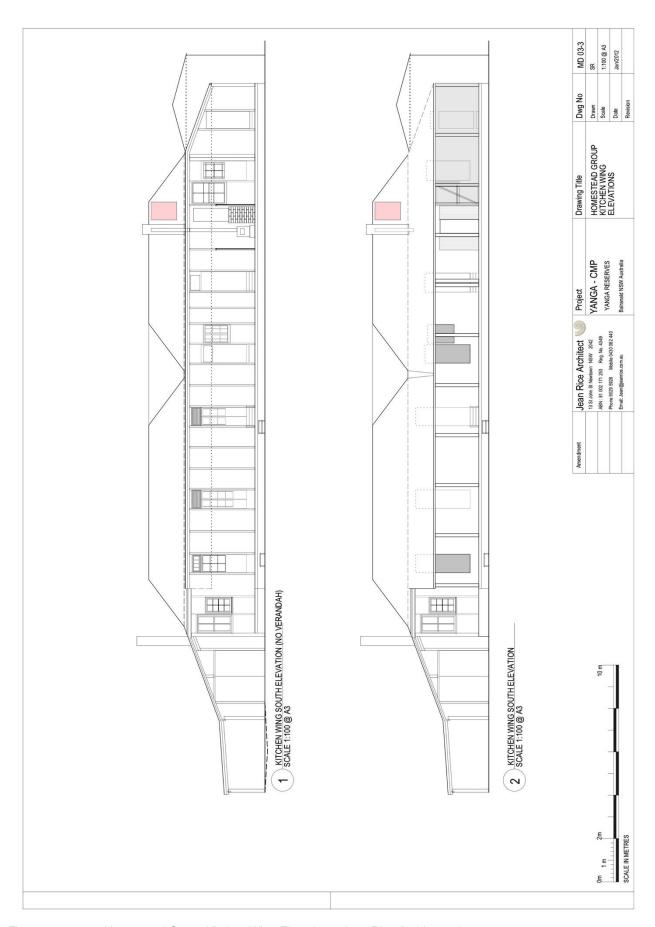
Homestead Group Kitchen Wing Elevations. Jean Rice Architect, site assessment 2009.
